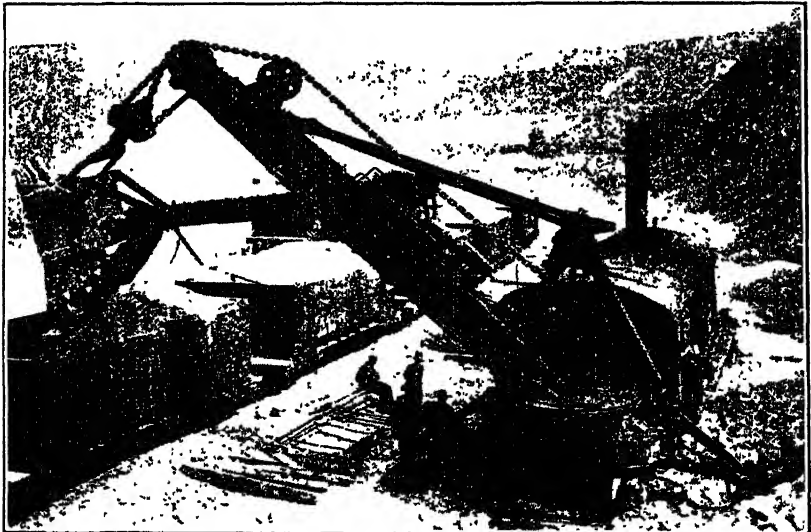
STEAM SHOVEL, RAILROAD TRACTION, LOADING 80-TON ORE CAR.
